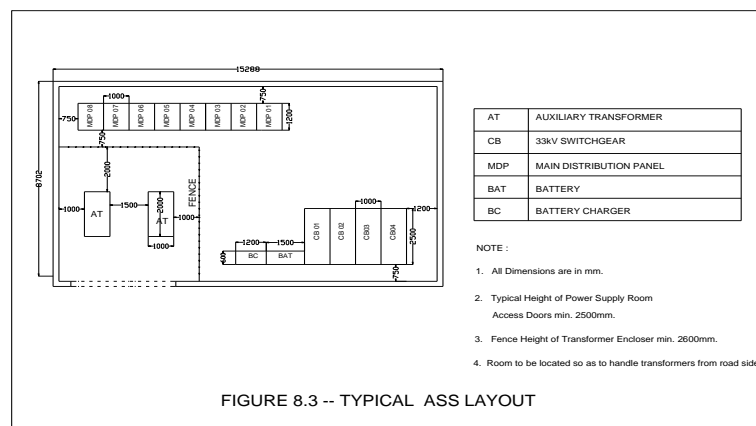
TYPICAL ASS LAYOUT
